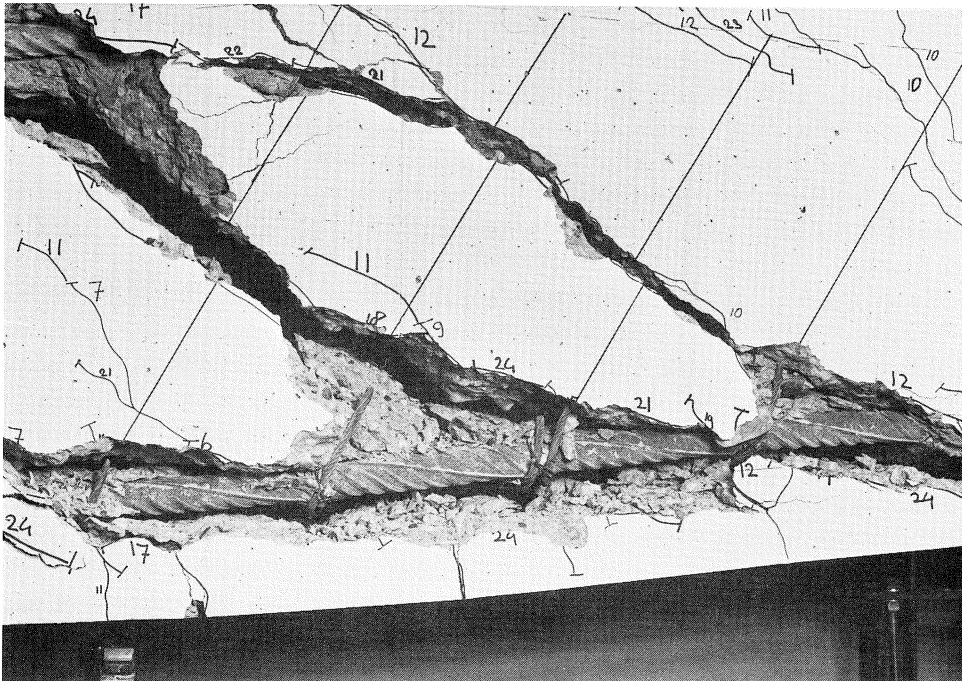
Failure of reinforced concrete beam due to bending moment and shear force.
